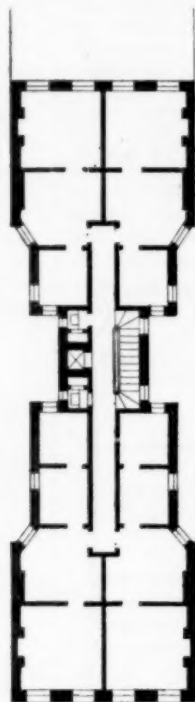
"Hour-glass" Plan, New York Tenement-house.
